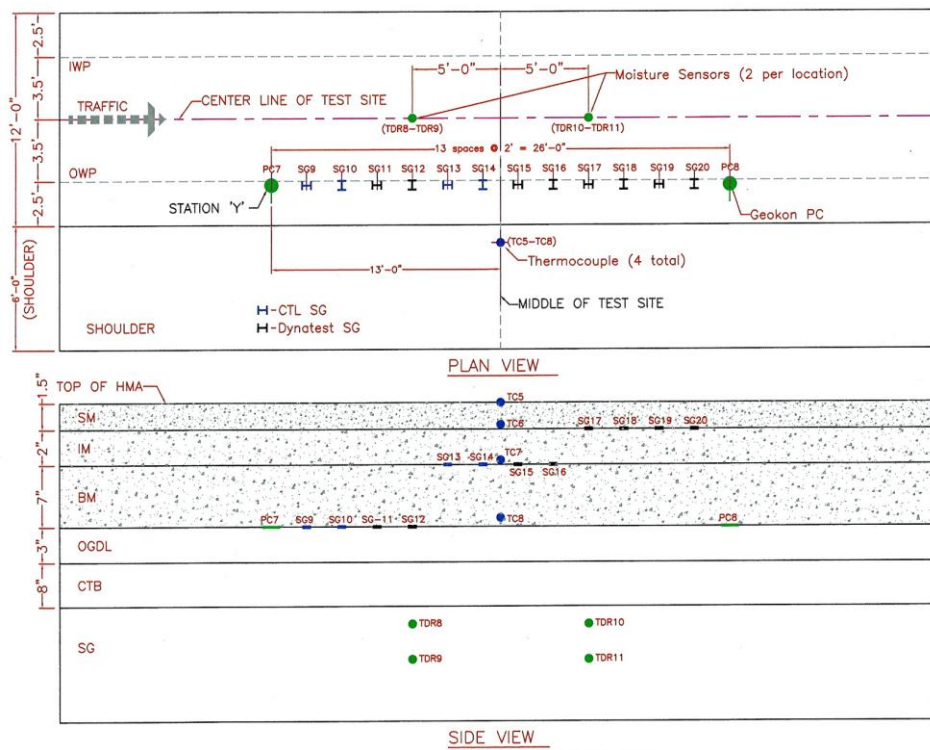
Plan and side views of sensors installed in the Virginia conventional pavement structure.
